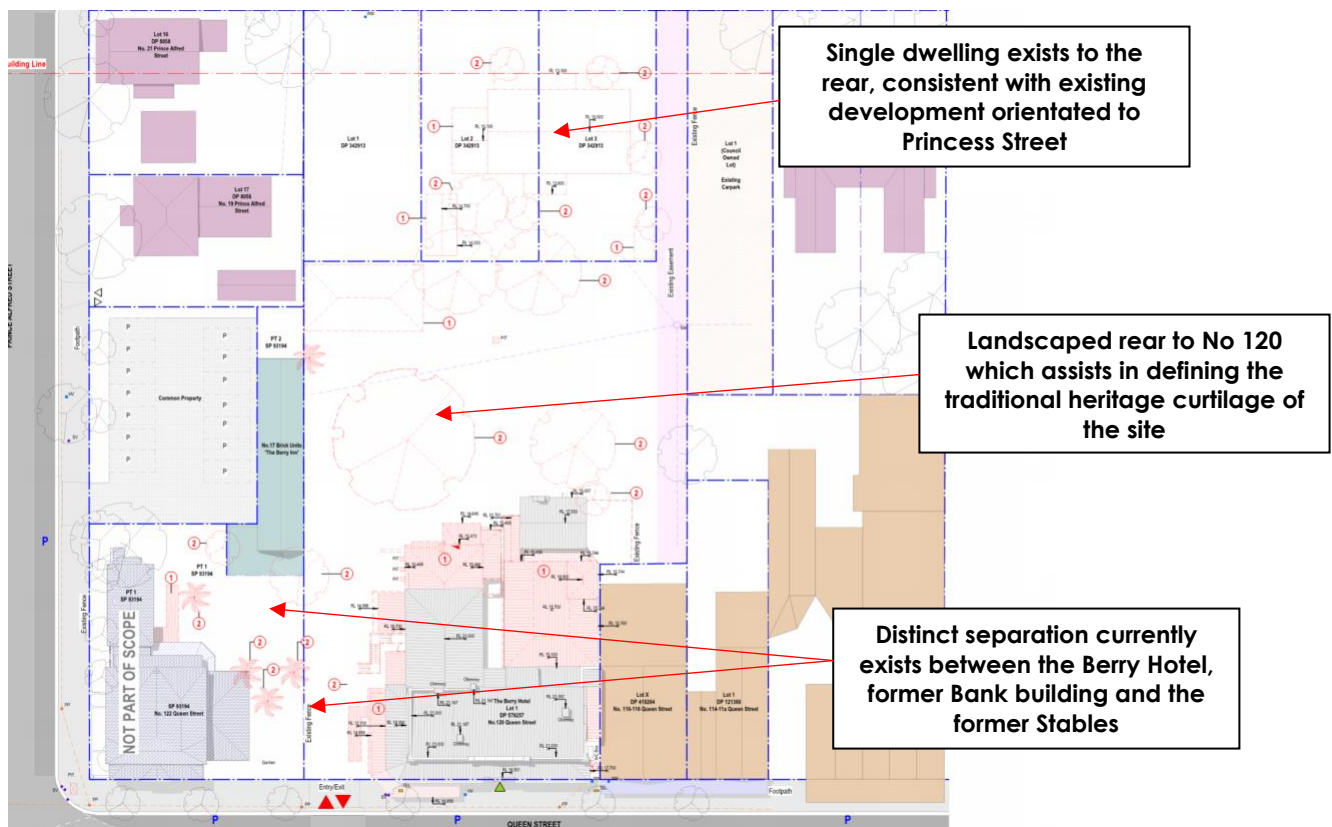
Extract from Existing Site/ Survey Plan which can be used to identify the curtilage of the items (H&E Architects, 2023)
